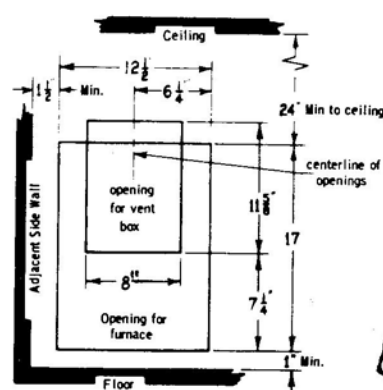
Front view showing furnace cutout and outside wall cutout for vent box
